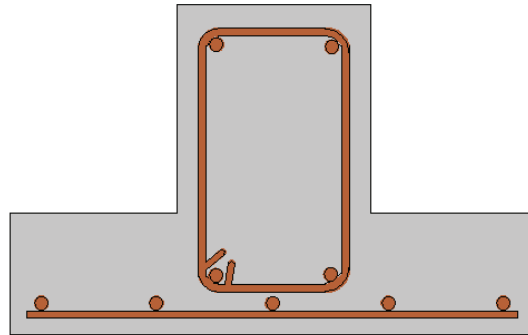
Stiffened Strip Footing: Inverted "T" type Foundation
